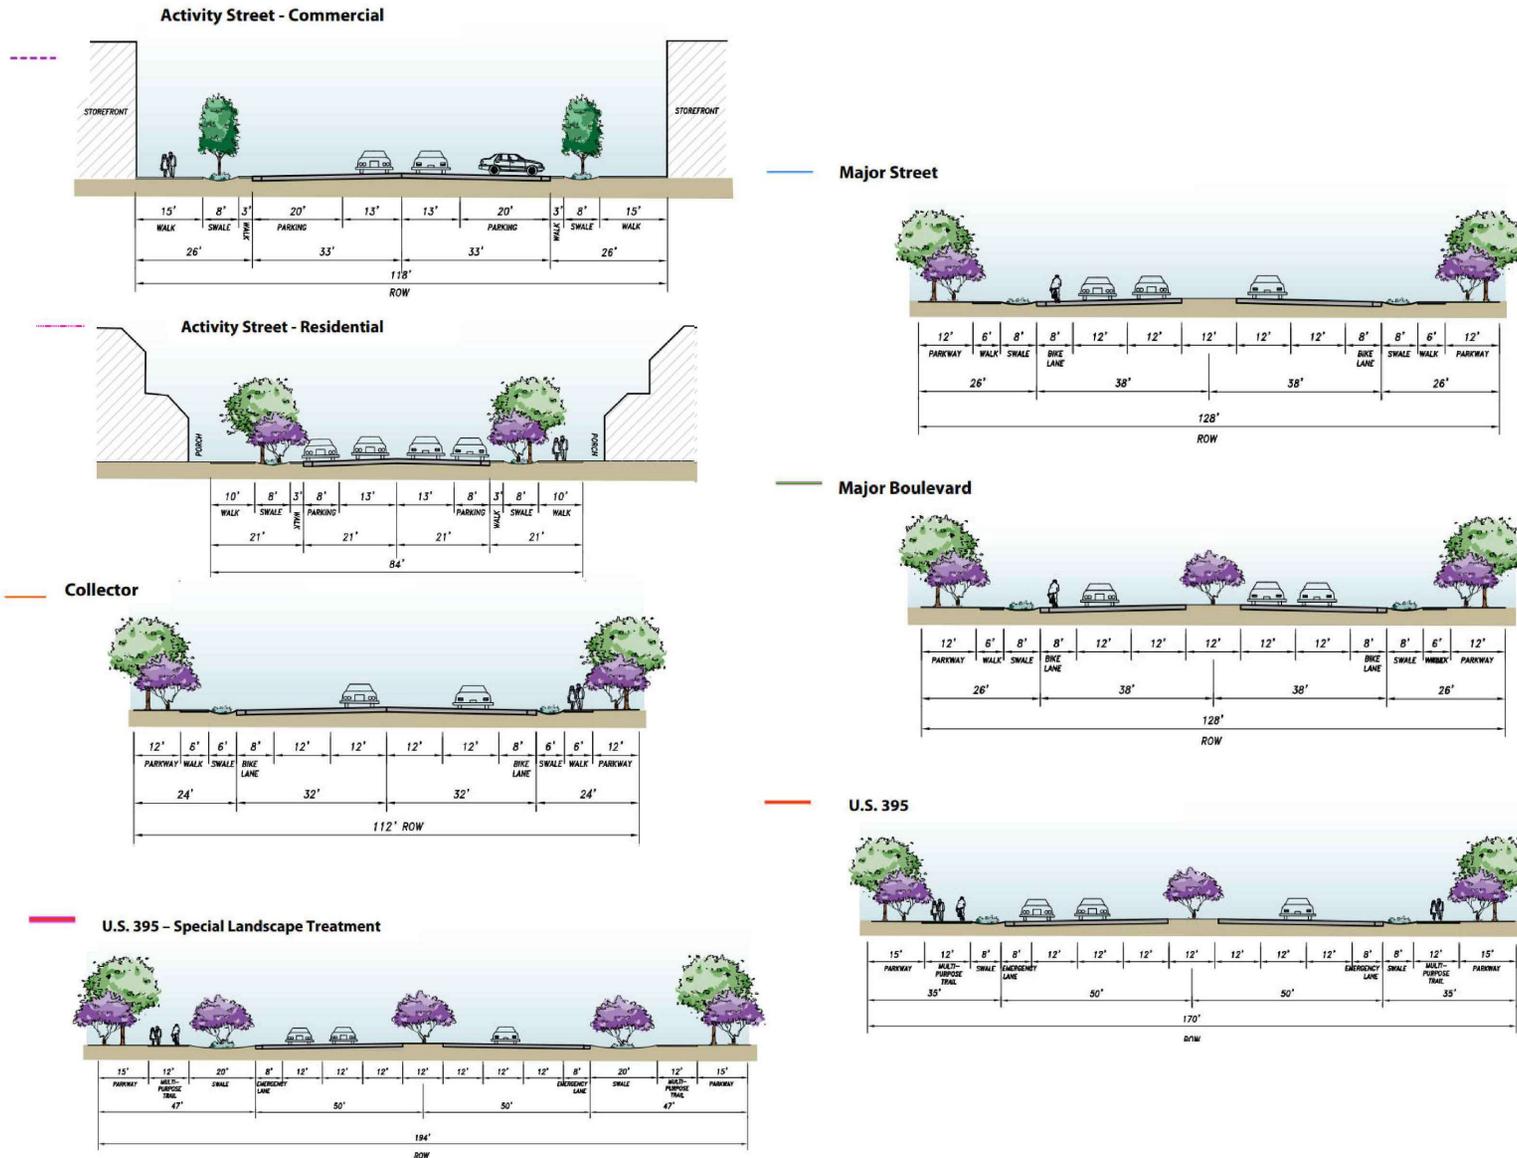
City of Adelanto General Plan Roadway Cross-Sections
